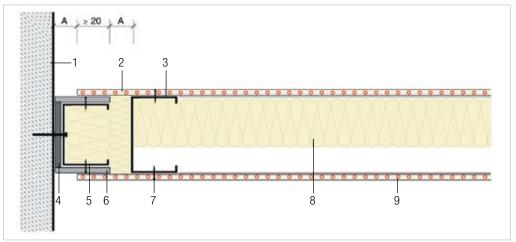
Example schematic representation of the construction of the floating wall and façade connection
